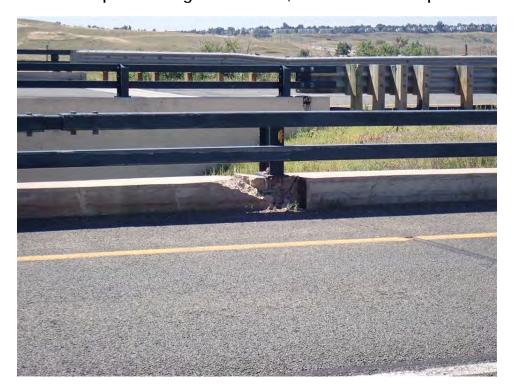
Typical Impact Damage to Steel Guardrail (Eastbound at Milepost 52.95 Pictured)
